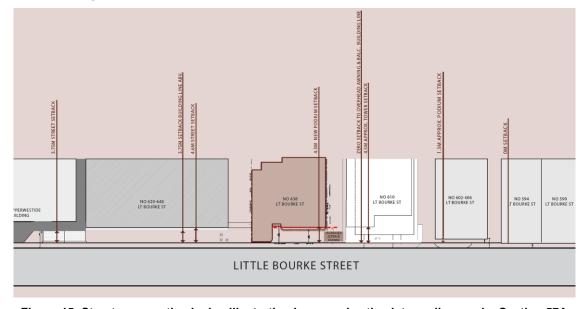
Streetscape setback plan illustrating increased setback to podium under Section 57A plans
